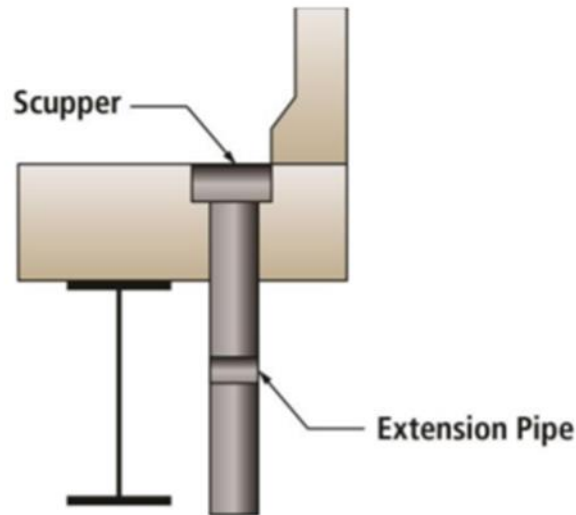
Schematic of an open deck drainage system with vertical penetration
